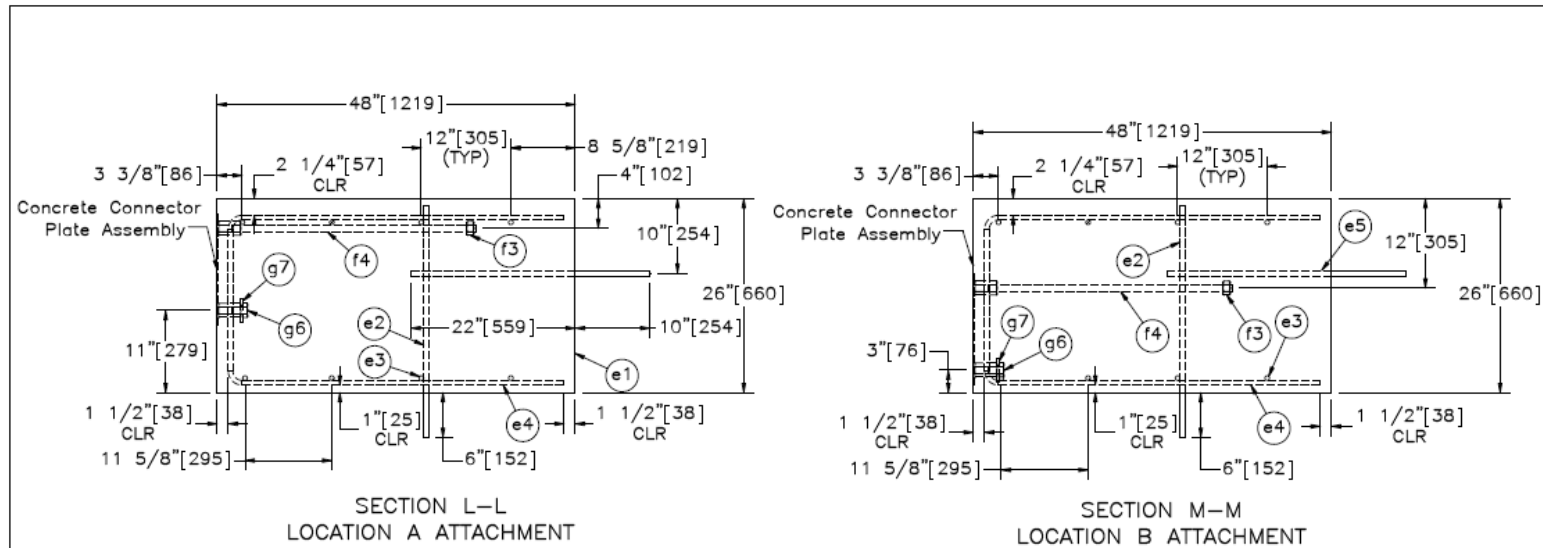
Test Slab Assembly Details, Test No. STBR-2
